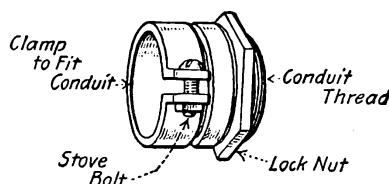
Connector for attaching flexible steel conduit to an outlet box.
